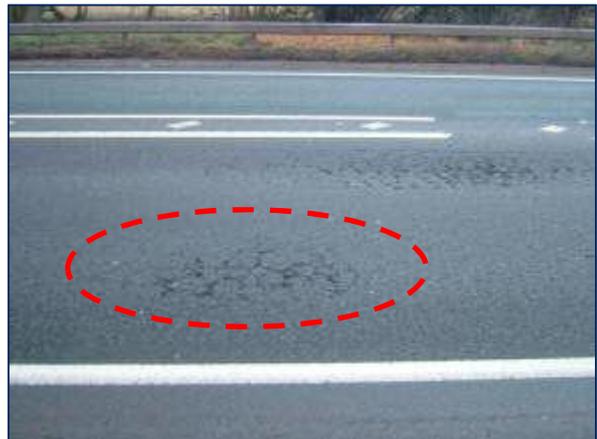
General SB view - poor surface dressing (Section 1900A5/171, ch. 0 m)
